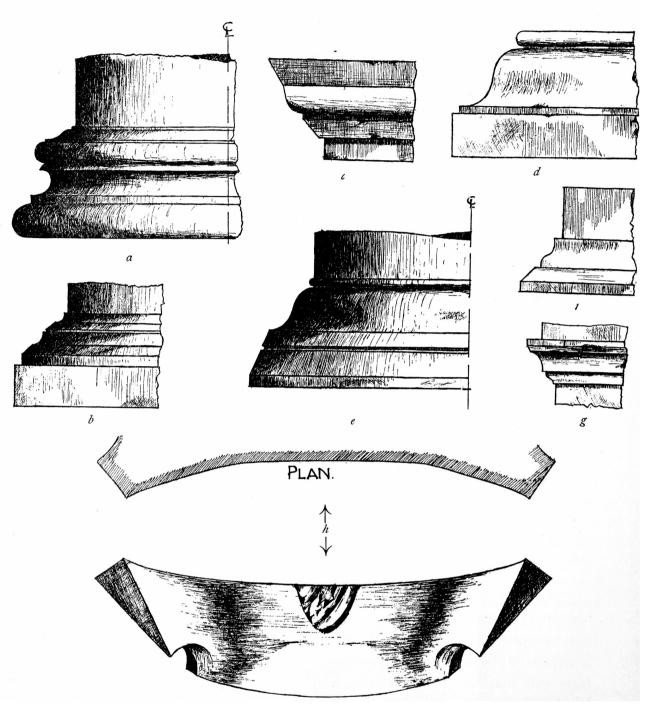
ABDA: LIMESTONE ARCHITECTURAL MEMBERS FROM SITE OF NORTH CHURCH.
